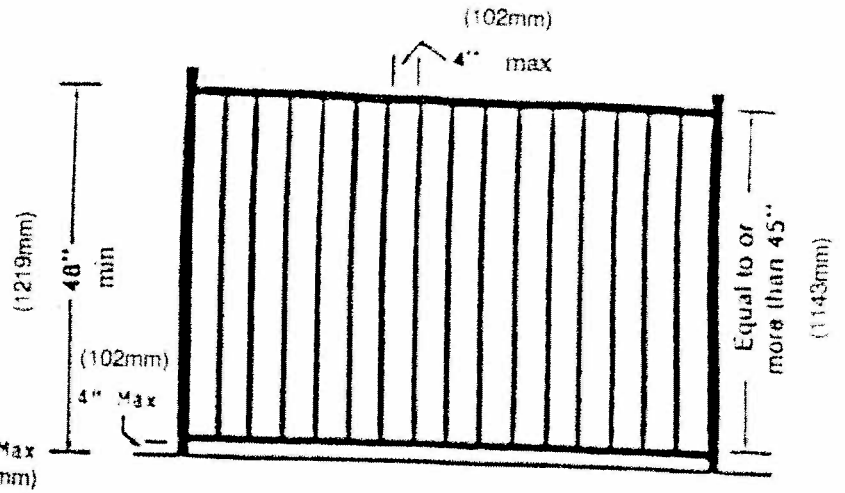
FIG. B IF HORIZONTAL MEMBERS ARE EQUAL TO OR MORE THAN 45° APART, THE SPACE BETWEEN VERTICAL MEMBERS SHALL NOT EXCEED 4".
